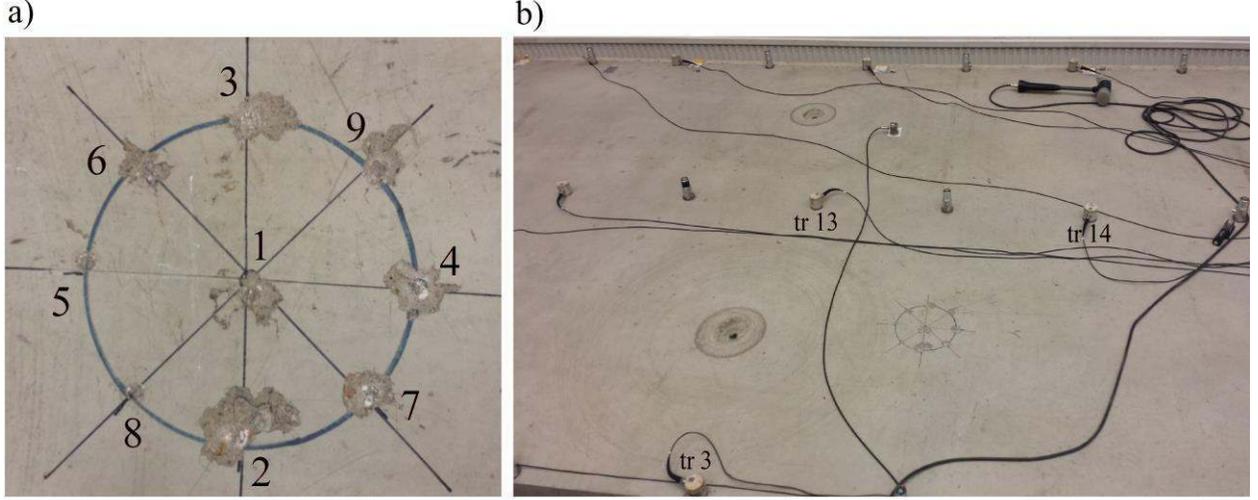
Photographs of the damage to the concrete from the bolt gun shots. a) Close-up of the damaged area. The numbers signify the order the shots were fired in. b) Damaged area in relation to surrounding transducers. Closest in-picture transducers are numbered. Also seen are other types of transducers, not referenced in this paper, and two of the threaded holes used for lifting the floor slab.
